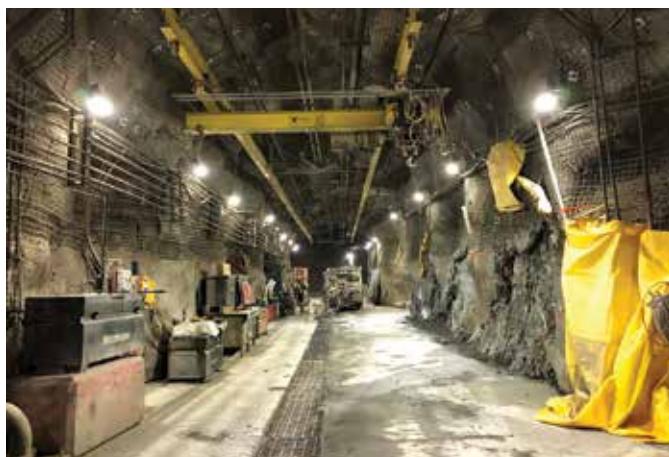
Maintenance area showing a replaced concrete floor containing Hard-Cem and a typical loader at the New Afton Mine in Kamloops, BC, Canada
